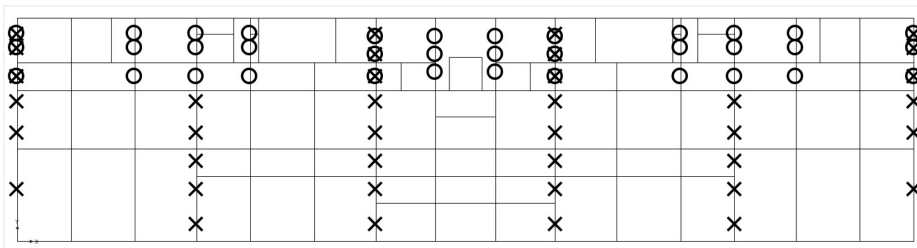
Damper Placement at 3rd floor (SR-Y); MSSSA: 36 dampers;
